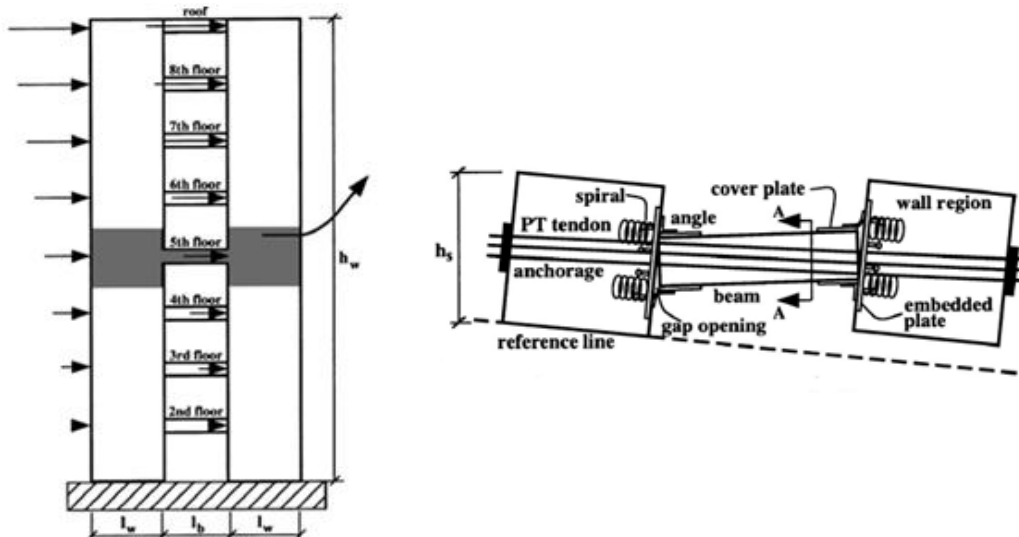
Coupled wall system: a) multistorey wall, b) beam-wall connection [17]
